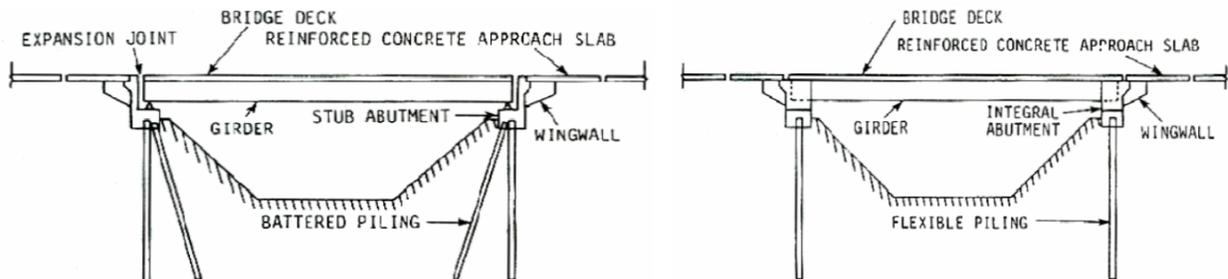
Schematic of a Jointed Bridge (Left) and an Integral Abutment Bridge (Right) [2]
